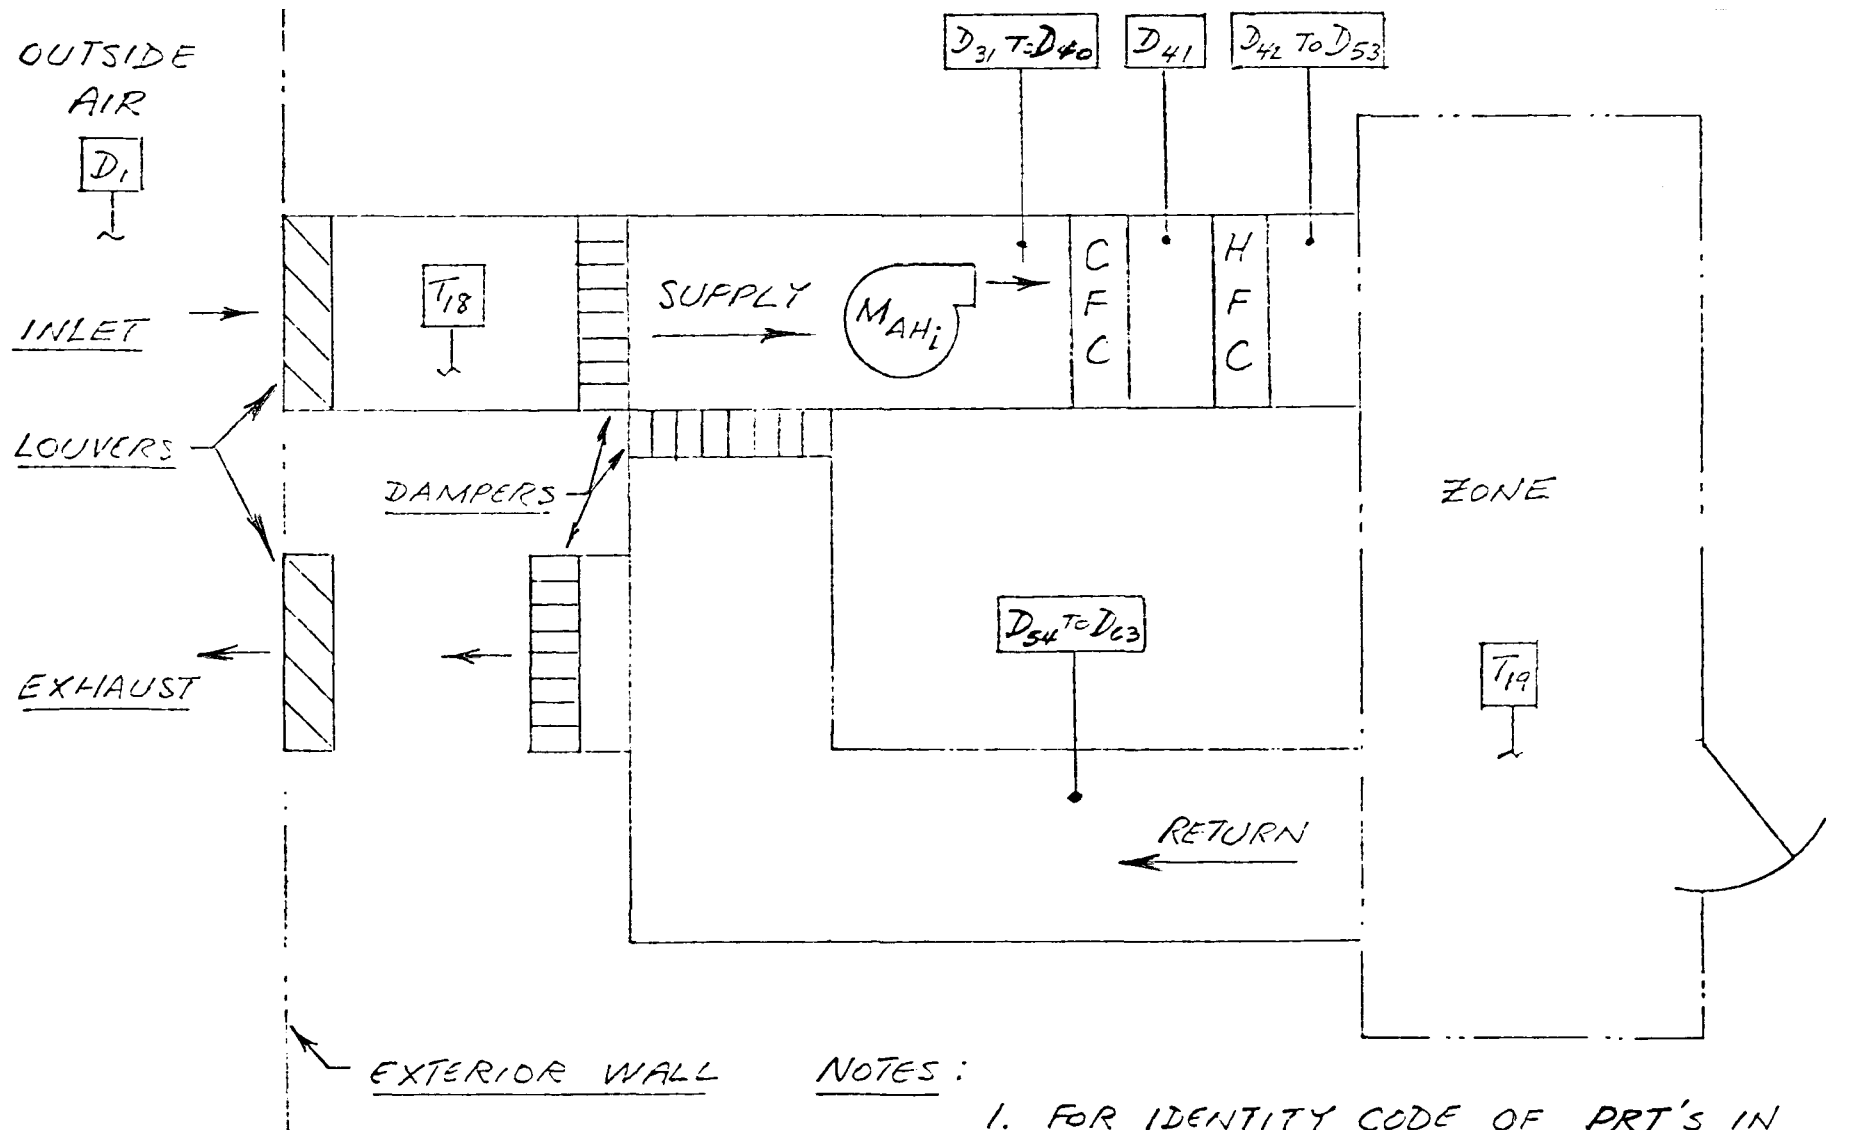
Typical Zone Duct Arrangement With Instrumentation
